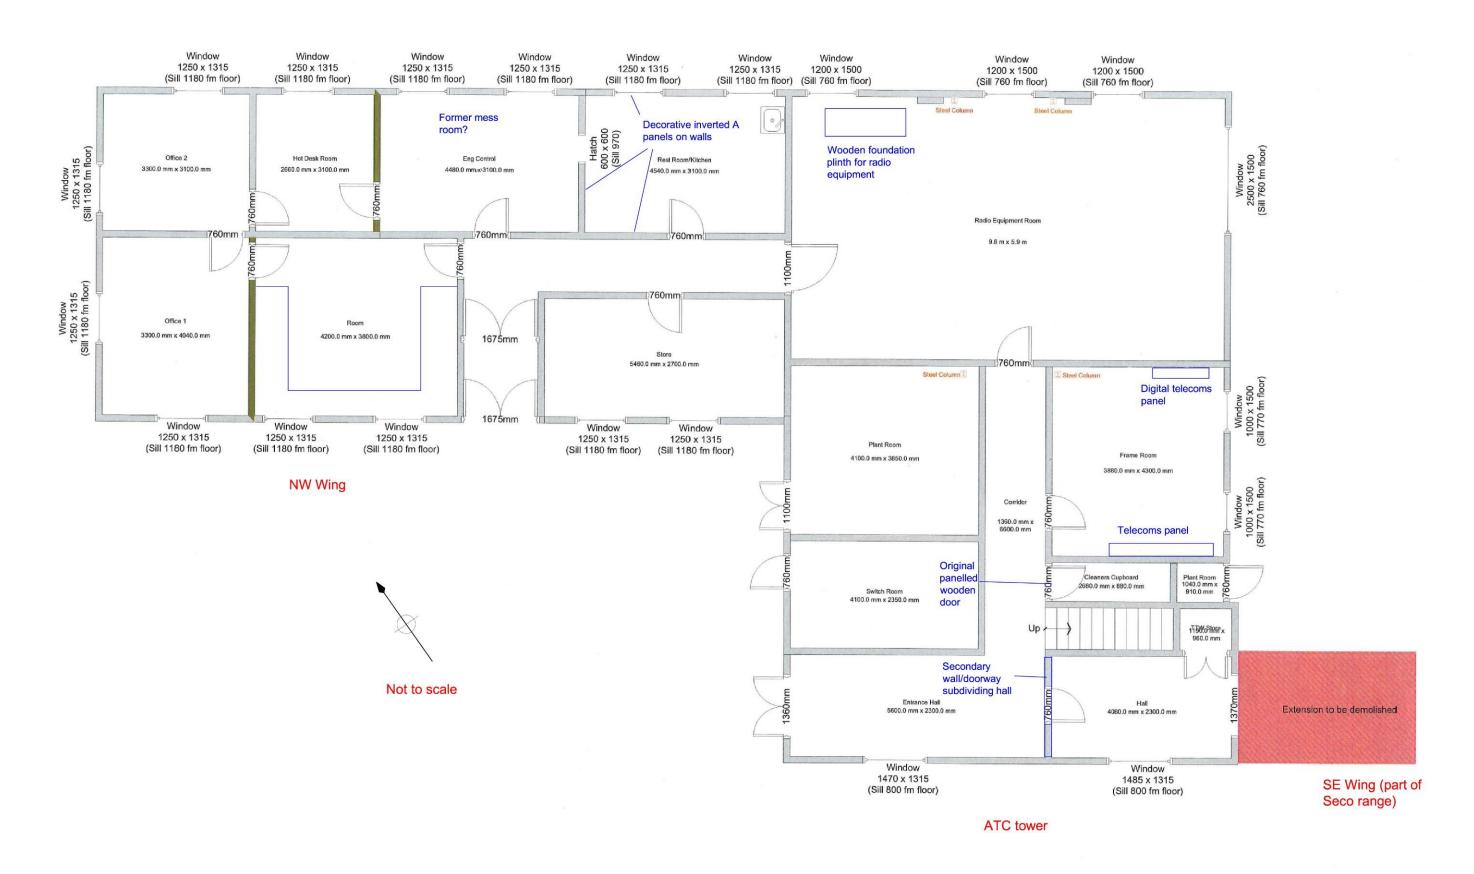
Ground floor plan of the former RAF ATC tower and NW Wing
